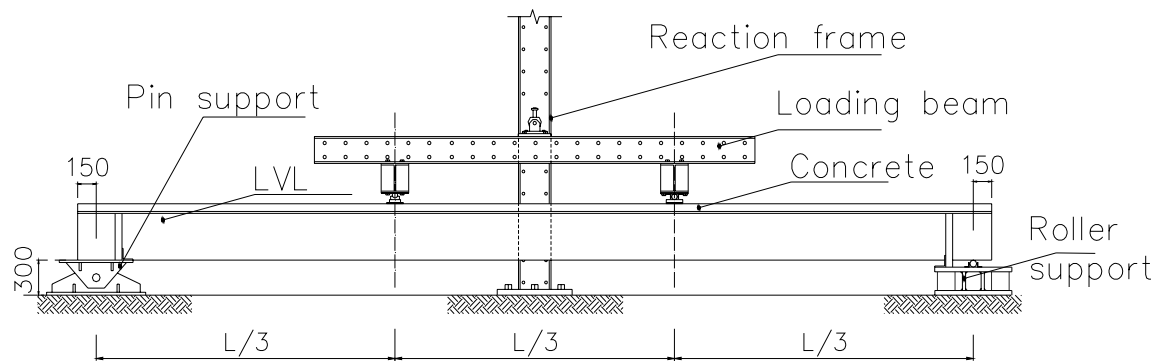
Four-point bending test setup for collapse test of TCC beams (dimensions in mm)
